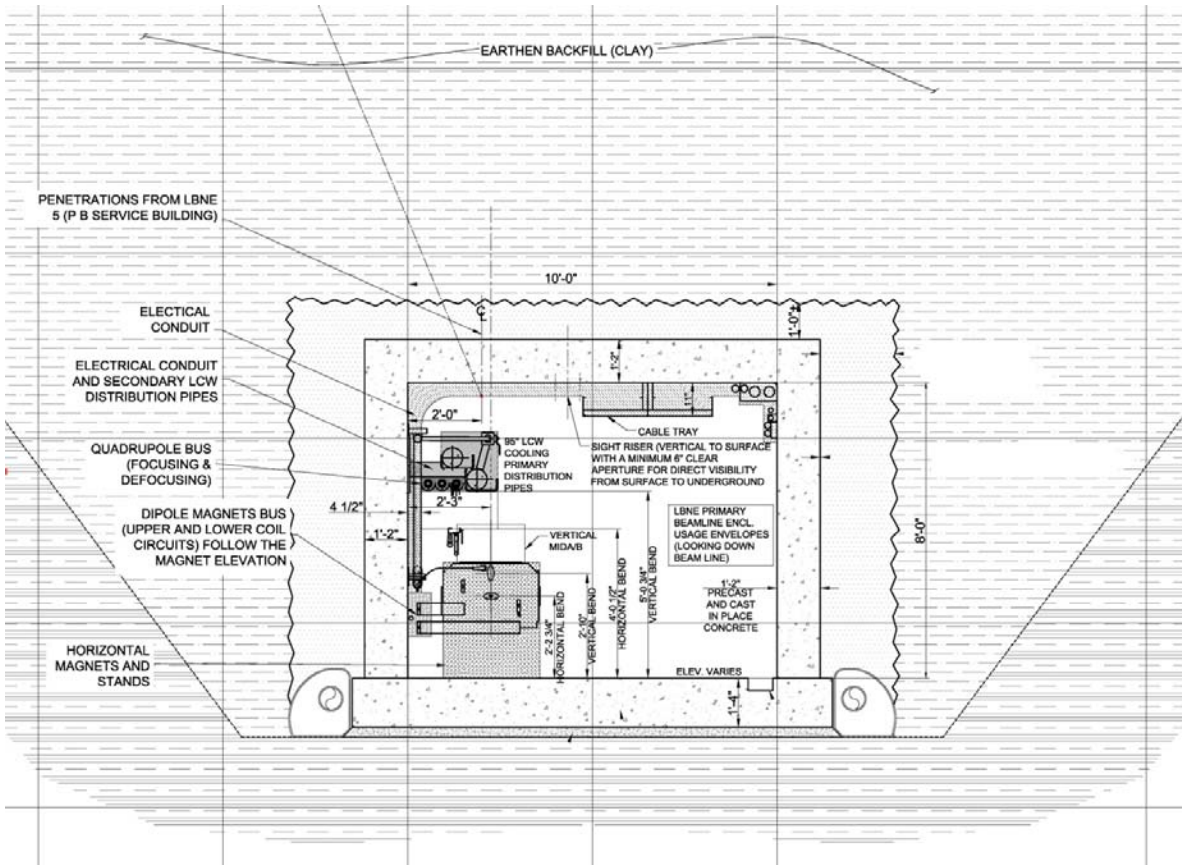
Primary Beam Enclosure showing technical components. Typical enclosure section.
